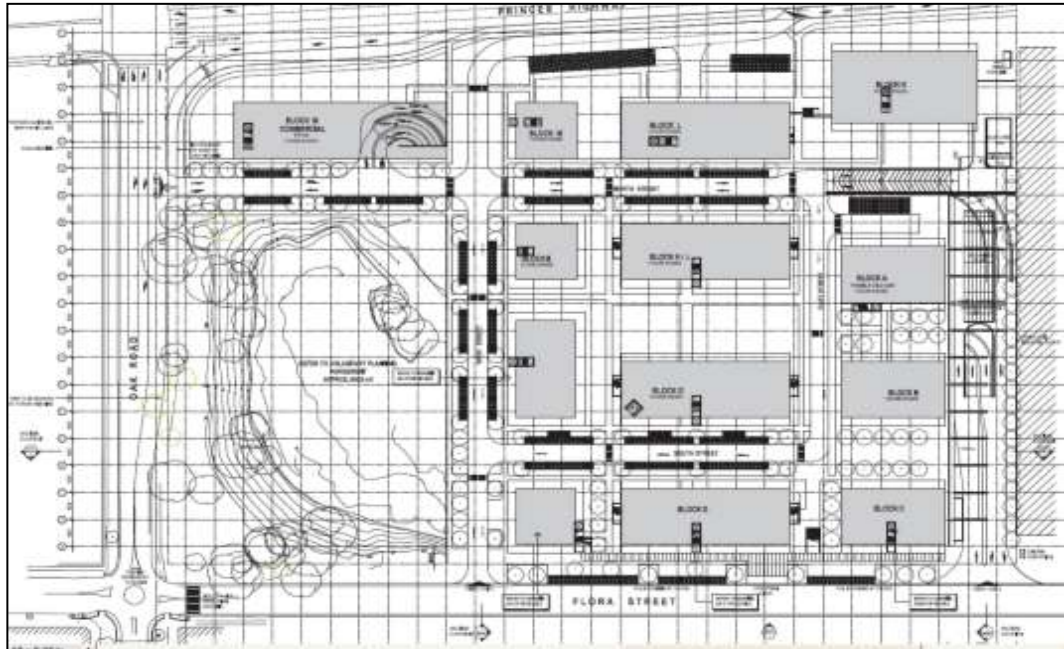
Floor plan of the previous DA (Source – GMU/Woodhead)
